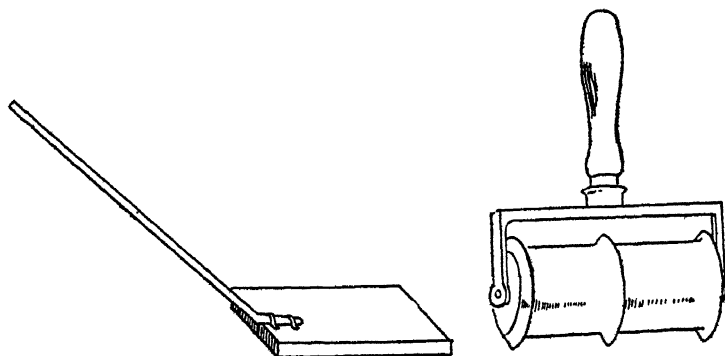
SURFACE FLOAT AND GROOVING ROLLER FOR FINISHING THE SLAB.
